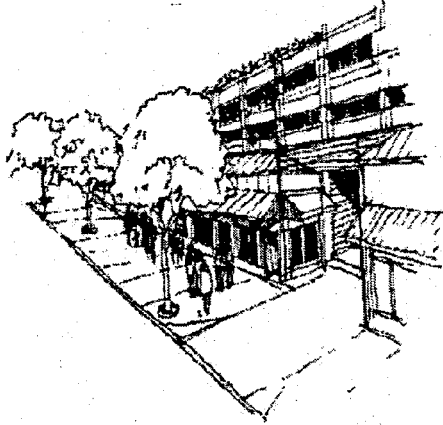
The parking structure has been set back to allow for retail uses at street level.
